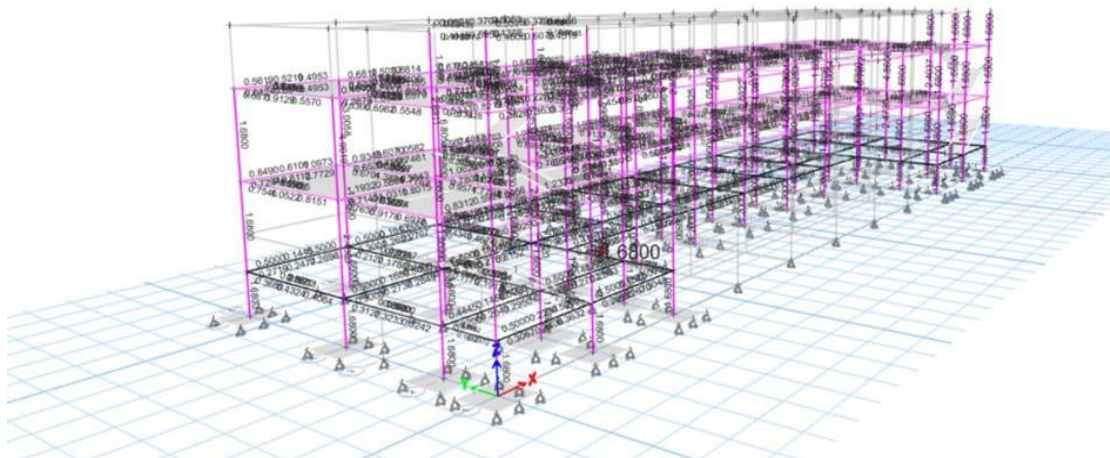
3D Dimensional All Floor Slab Beams Reinforcement
